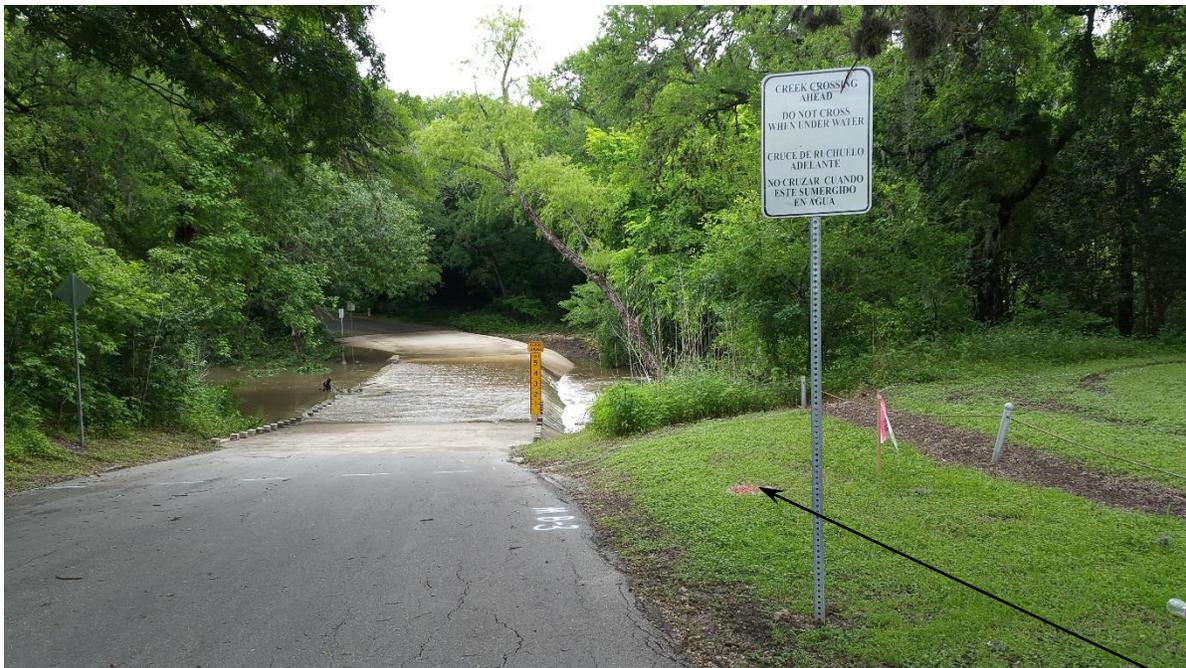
View looking towards the north at the low water crossing and the approximate location of Boring B-3 (marked with pink and white paint).
